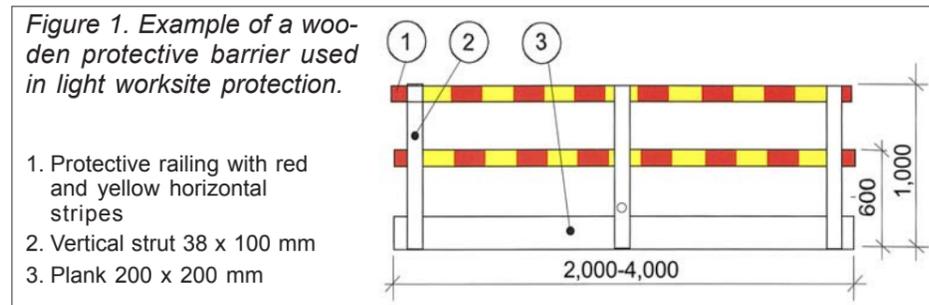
Example of a wooden protective barrier used in light worksite protection.
